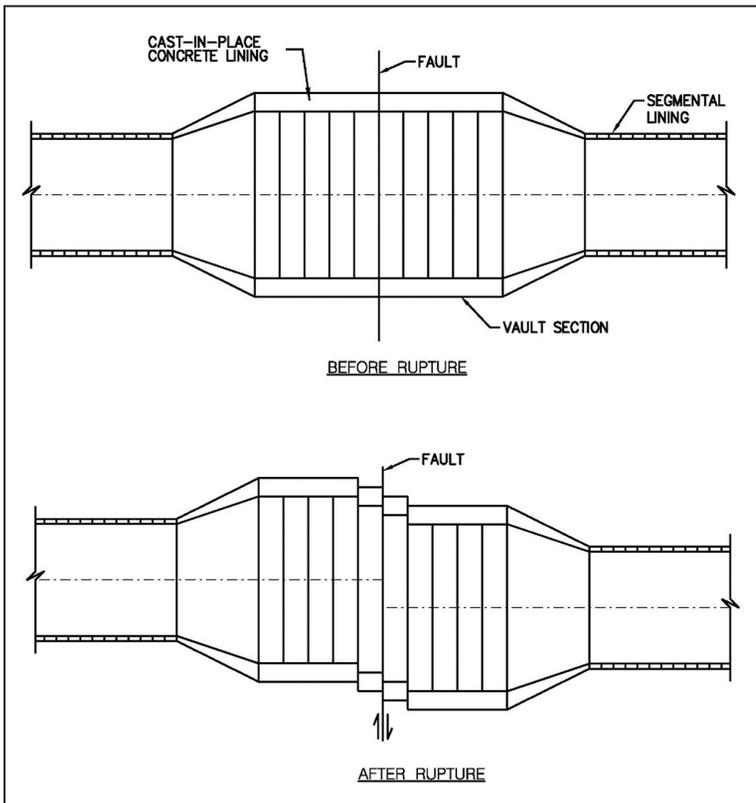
Plan layout of seismic section, demonstrating slinky articulation concept
